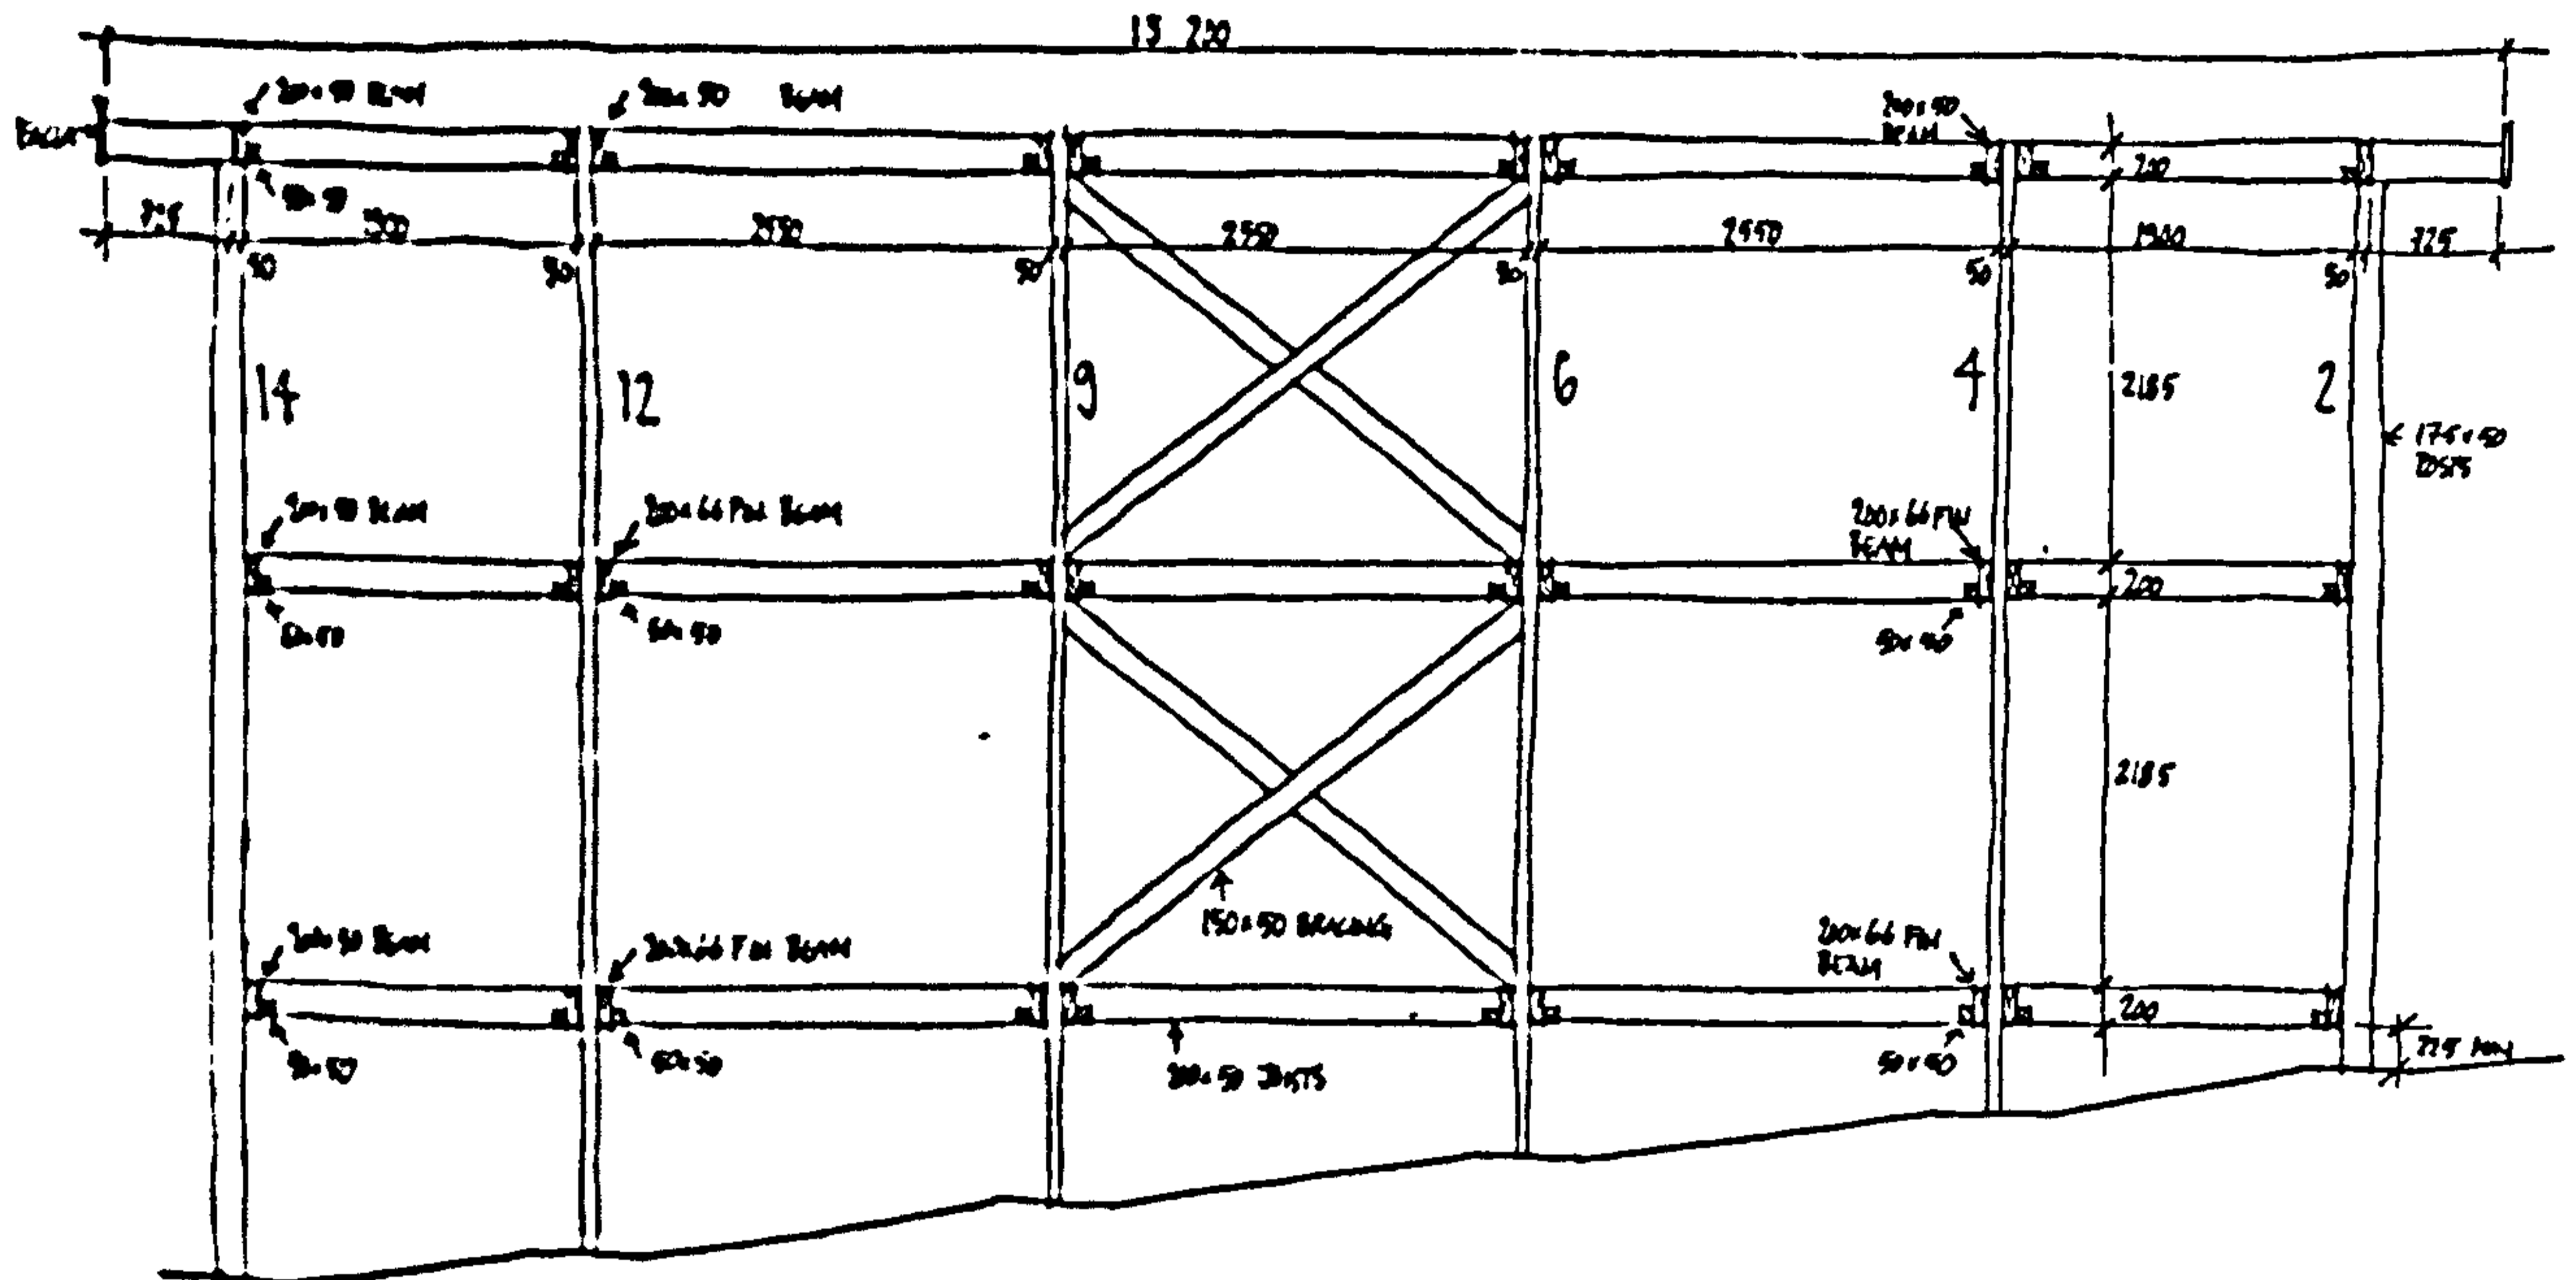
Segal System: framing drawing<sup>92</sup>
